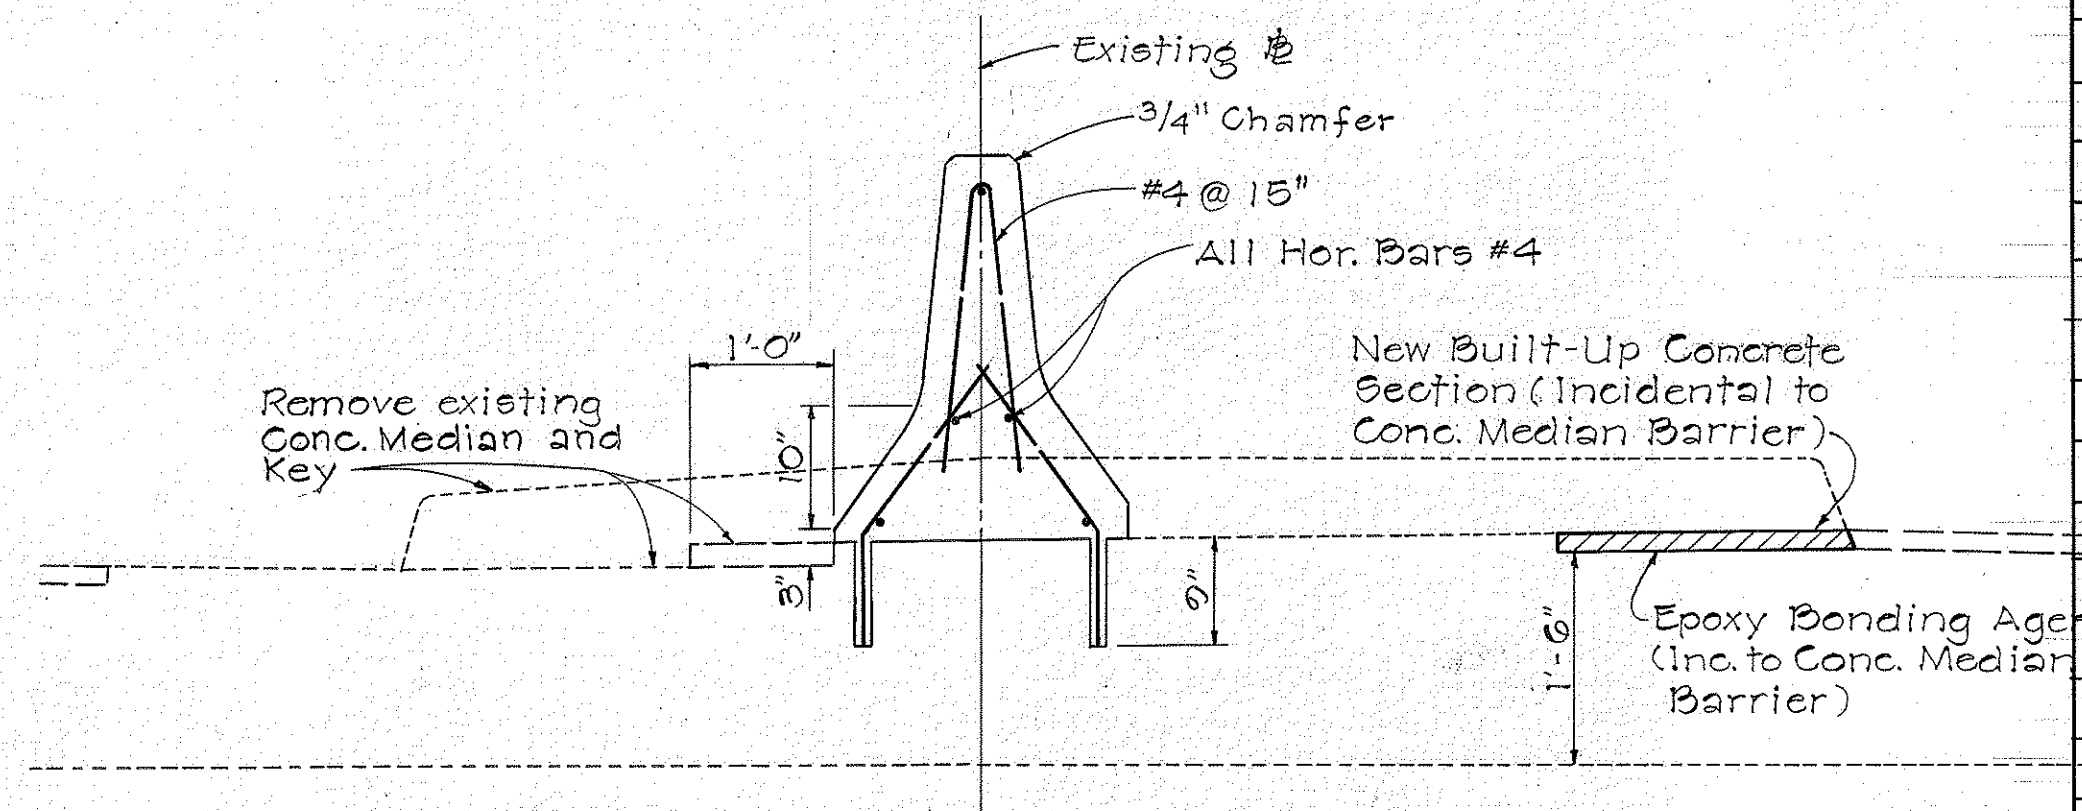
DETAILS OF TYPE "E" CONC. BARRIER ON EXIST. CONC. BRIDGE DECKS
